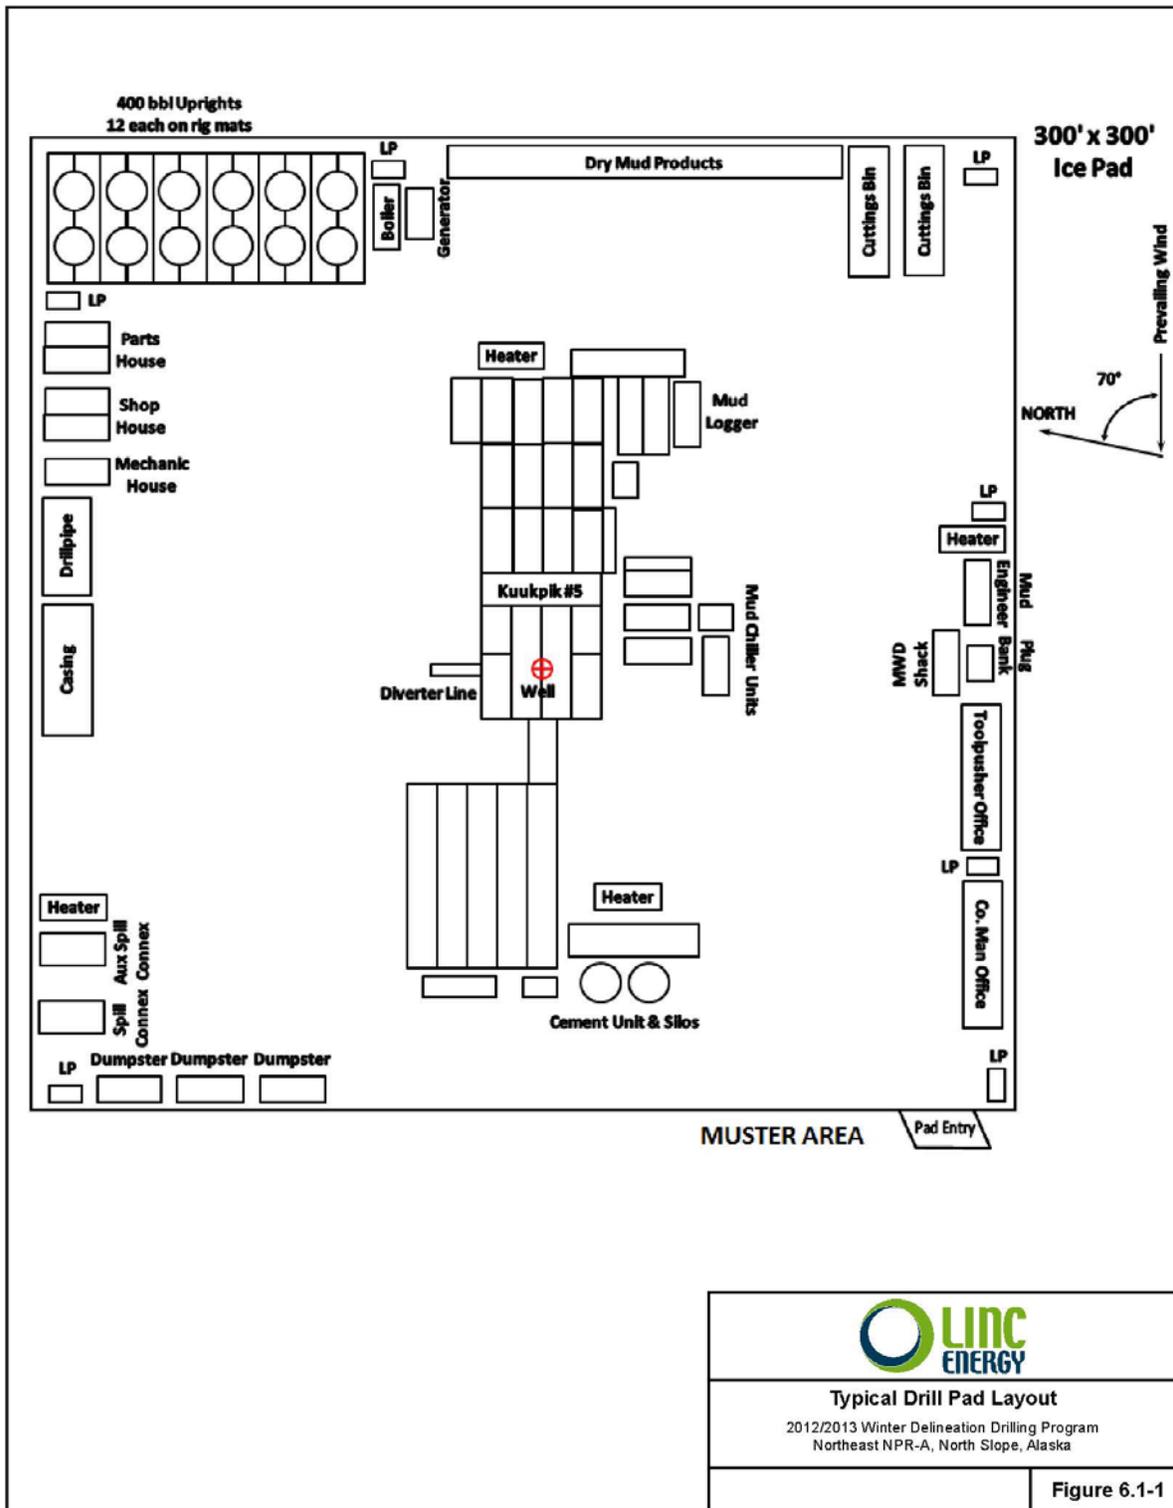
Applicant drawing of Typical Drill Pad Layout.
